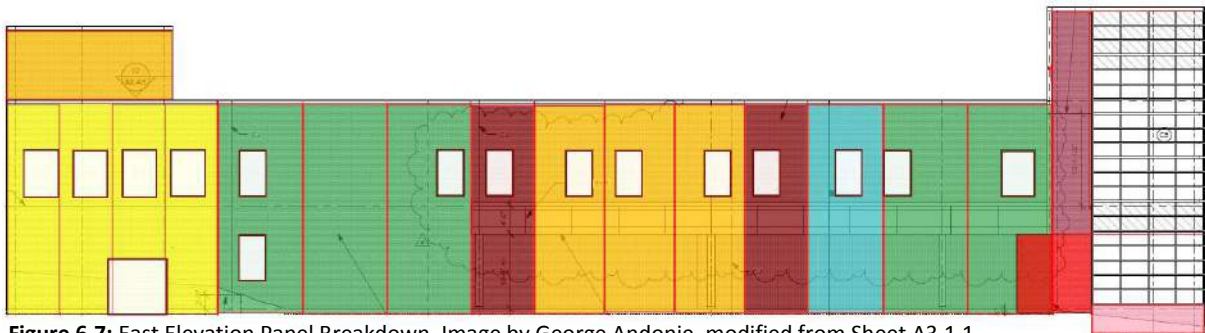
East Elevation Panel Breakdown. Image by George Andonie, modified from Sheet A3.1.1
